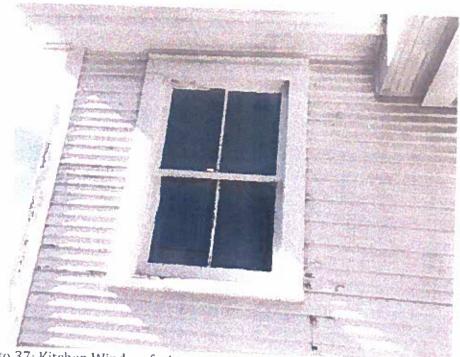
Kitchen Window facing east. The window has been replaced but some original trim remains.
